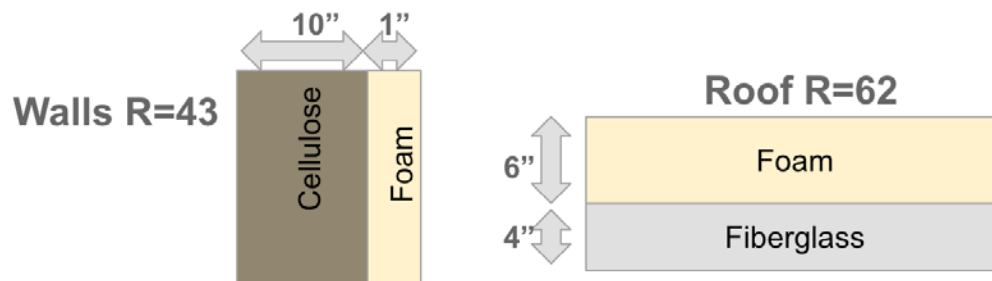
Illustration of proposed insulation, providing an R-value of 43 in the walls and 62 for the roof.
